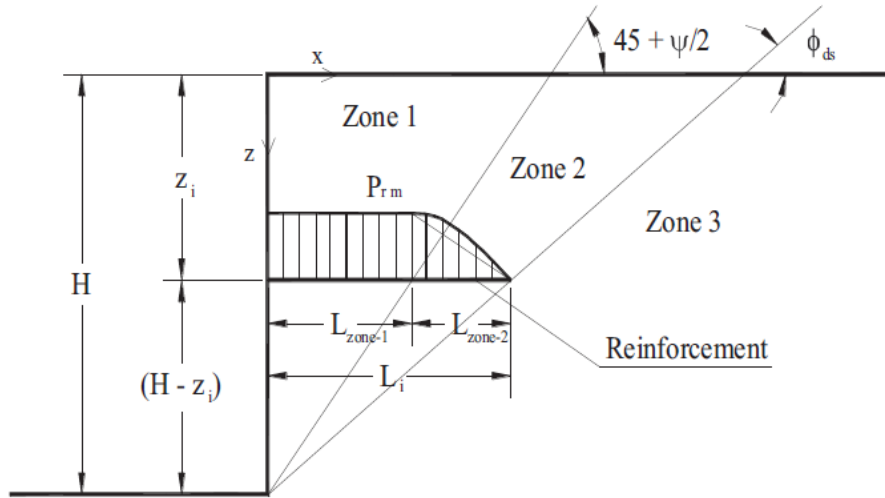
Zones of the reinforcement force in reinforced soil wall. (Jewell and Milligan, 1989).
